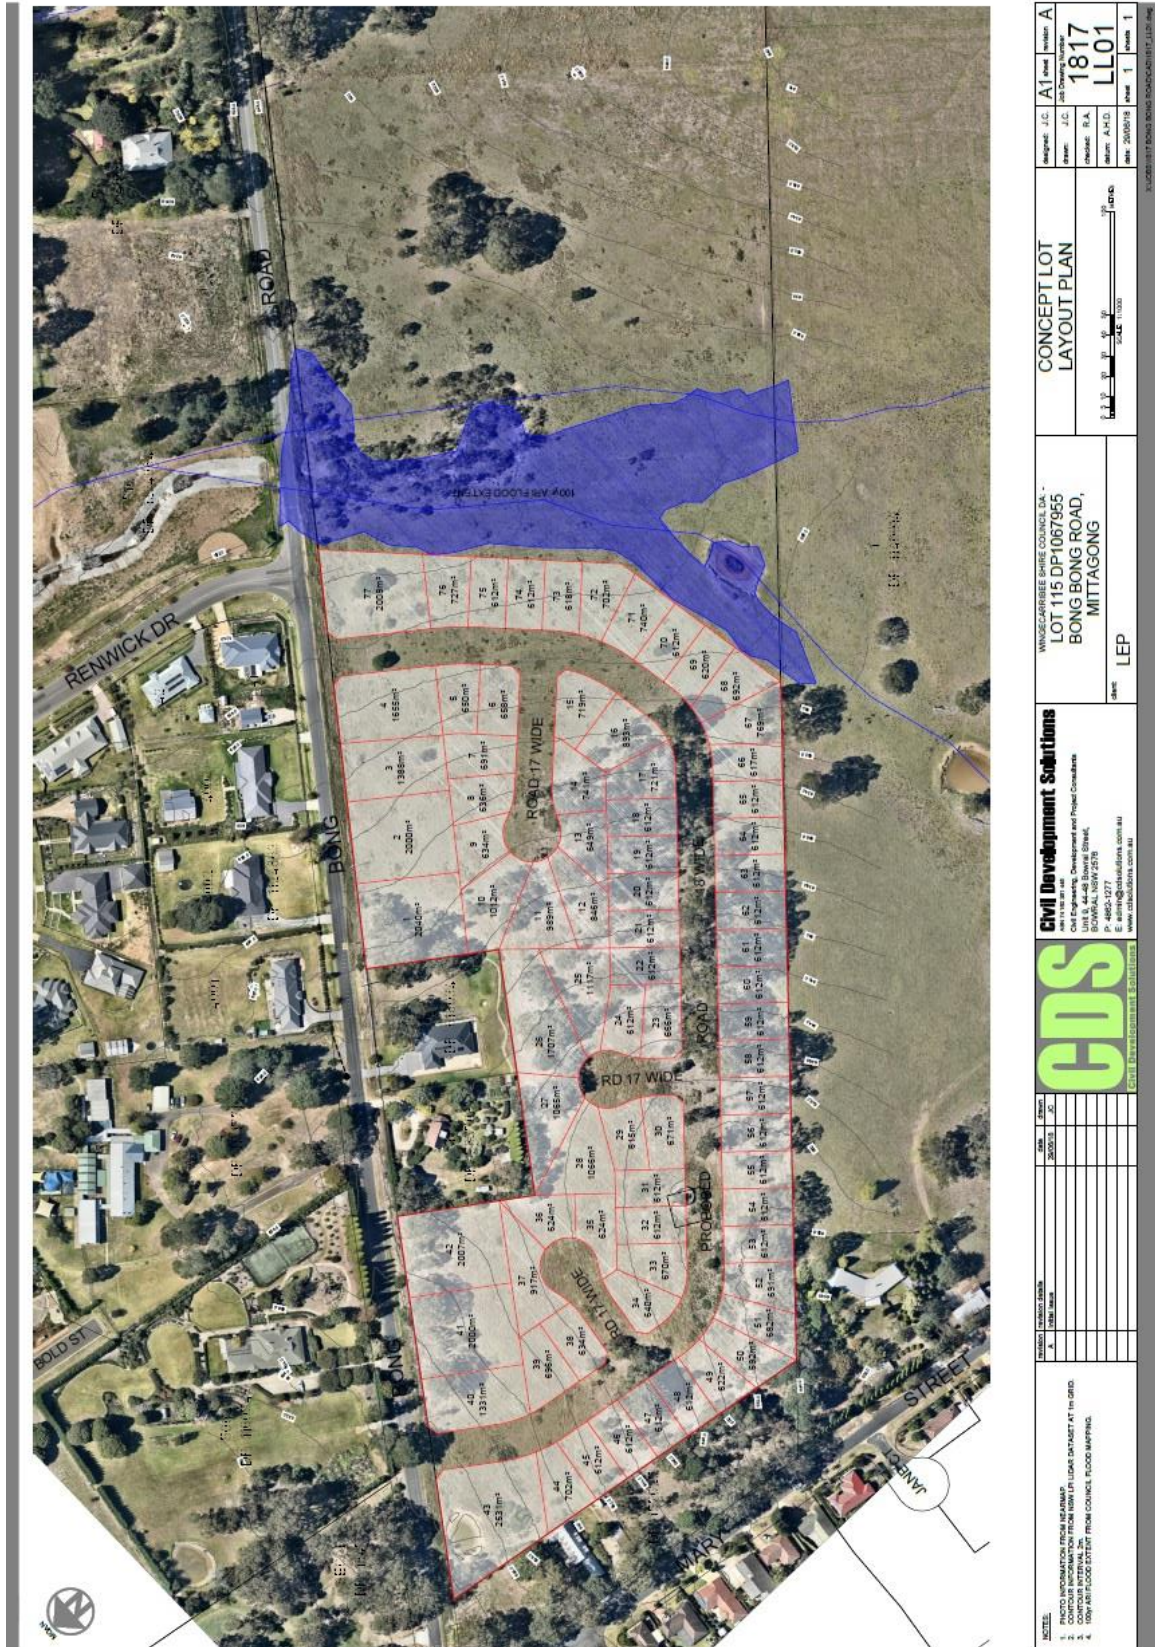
Proposed Concept Lot Layout Plan (Courtesy of Civil Development Solutions)
